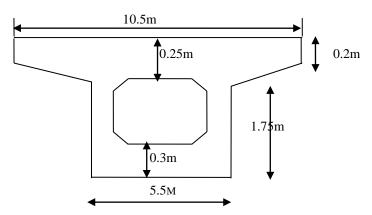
TYPICAL CROSS SECTION OF RECTANGULAR SECTION
